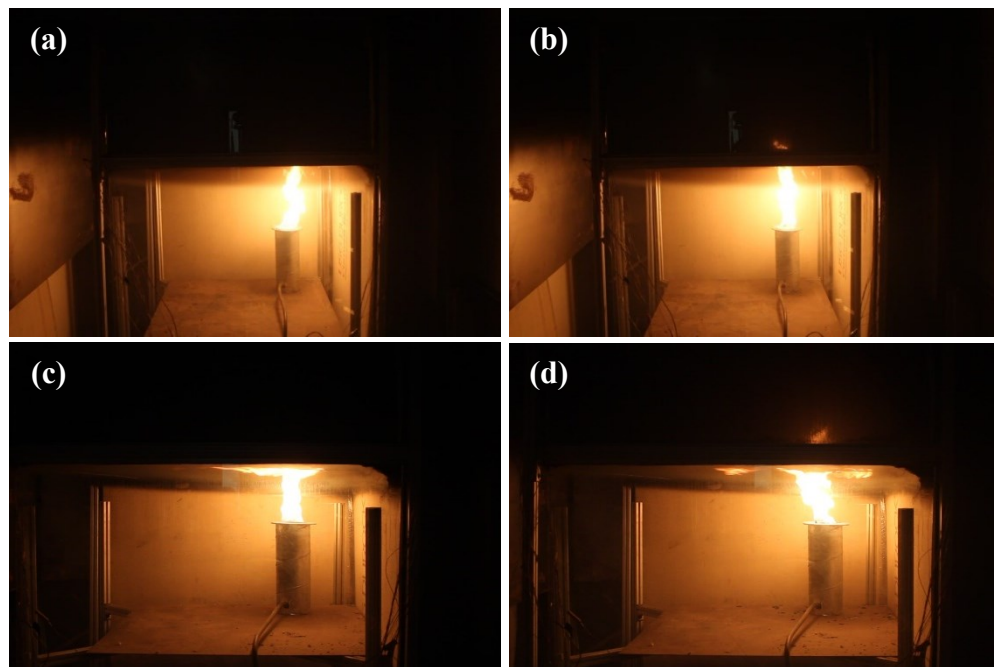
Examples of flame breakthrough, taken from (a) Test 3 prior to failure; (b) Test 3 after failure; (c) Test 6 prior to failure; and (d) Test 6 after failure.
